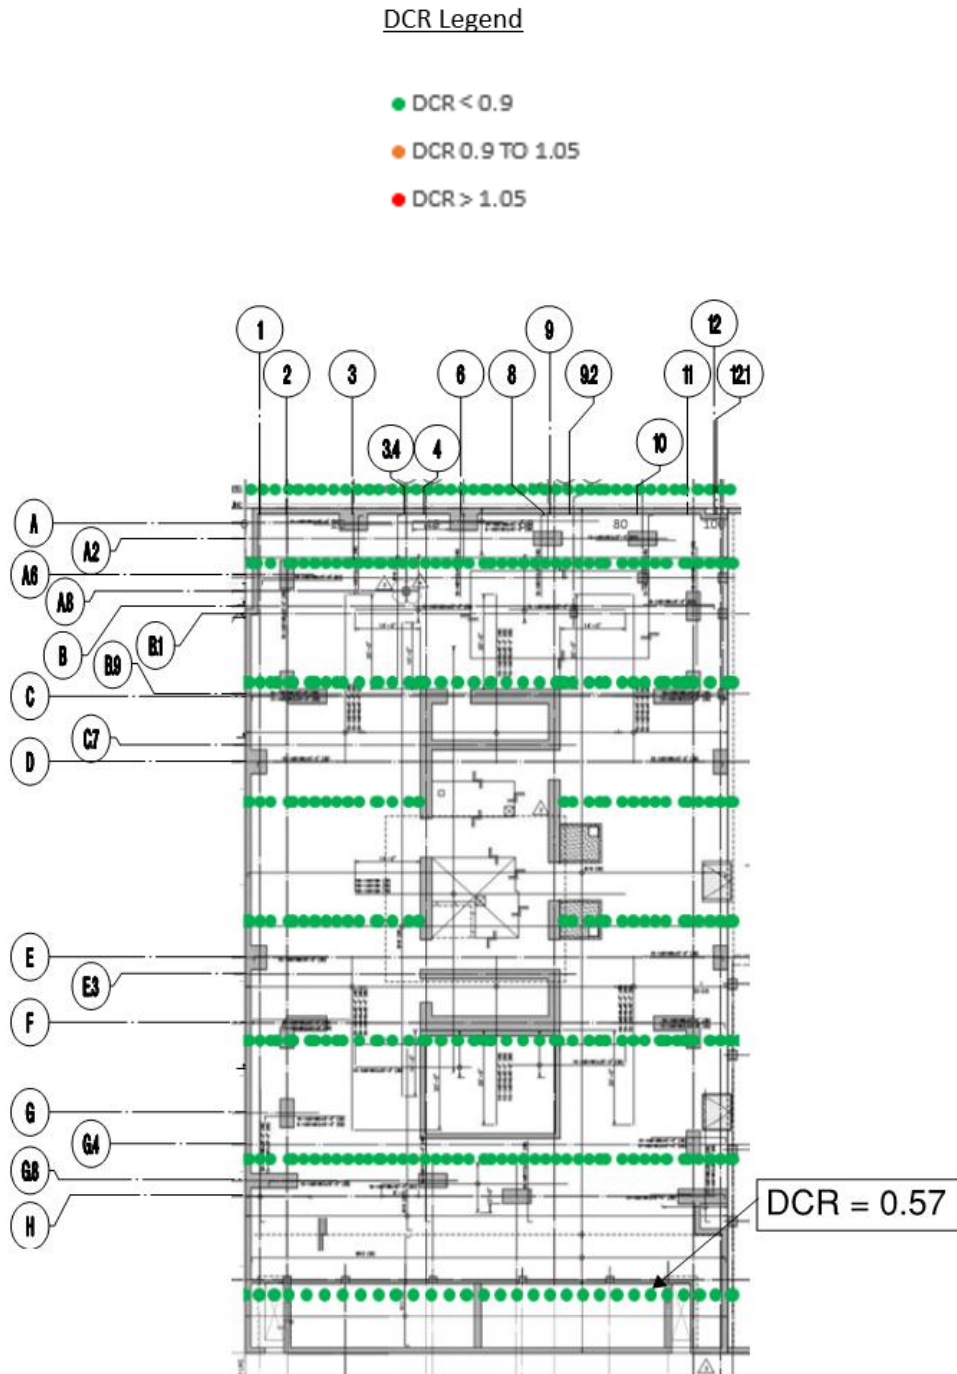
DCR Plot for East-West Top Reinforcement Design Strips for Gravity Load Envelope with Jacking Loads
